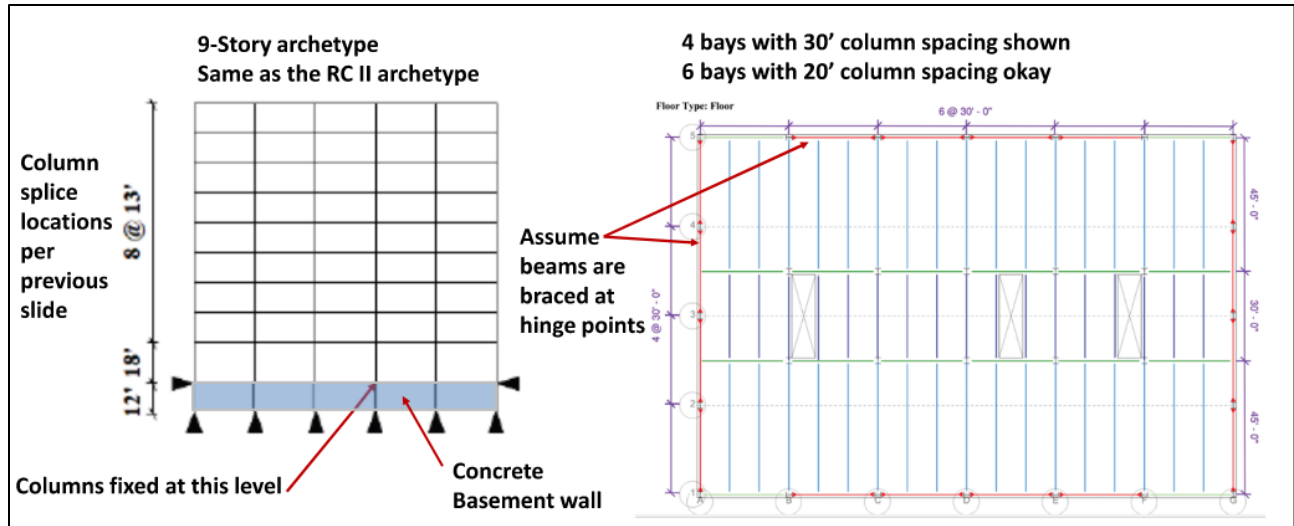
Elevation and Typical Floor Plan. See Appendix 1 for gravity framing sizes (Sized by MKA)
